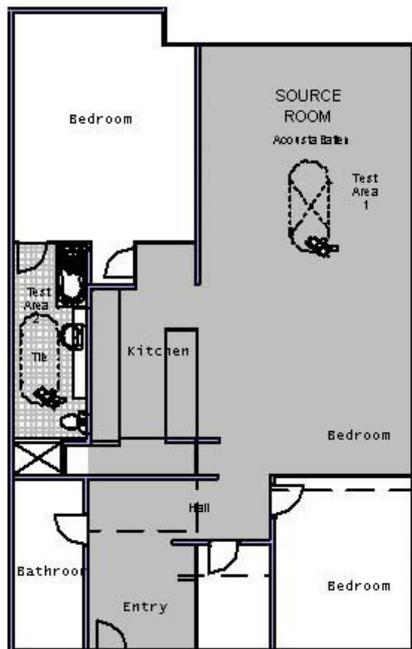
FLOOR PLAN – SOURCE ROOM
